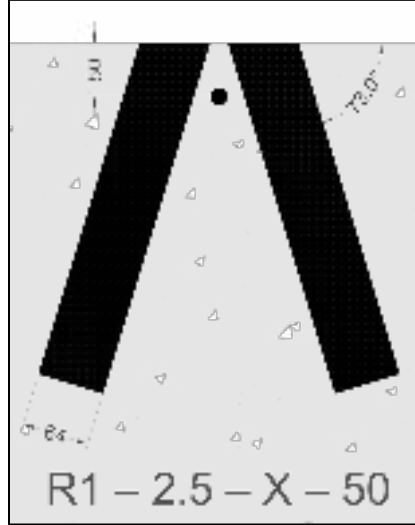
R1 – 2.5 – X – 50 plan view. Source: Own.
